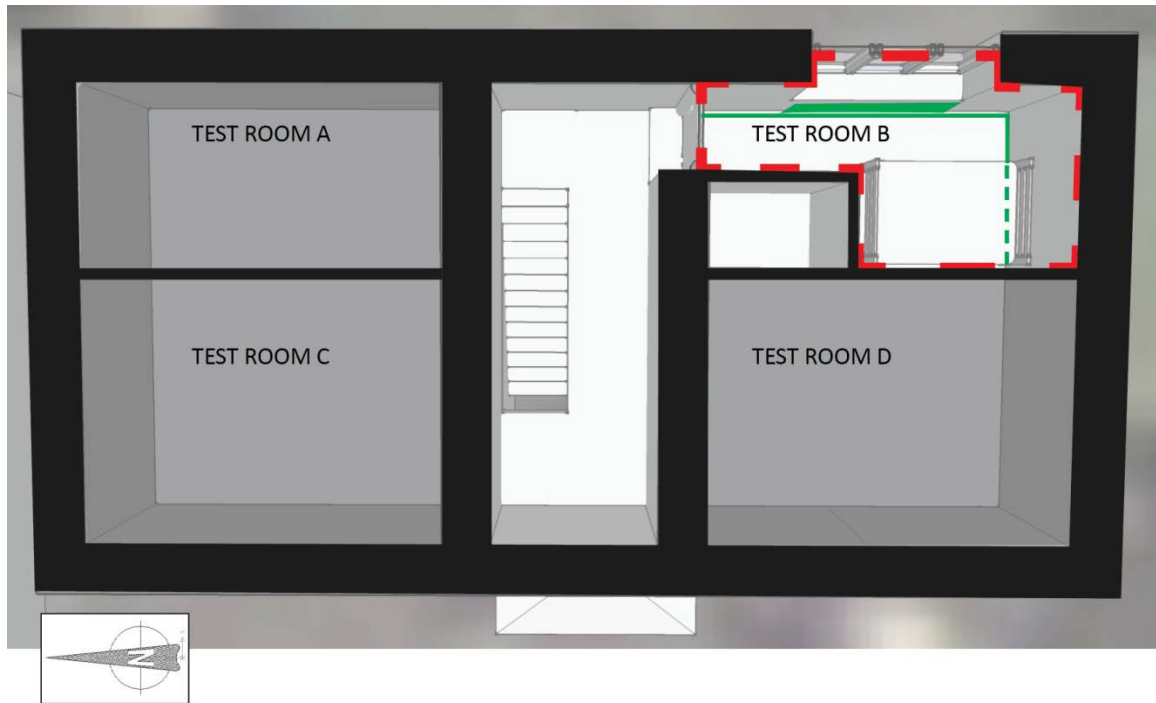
Second floor plan of test building at Rossinver, the chosen Test Room B is highlighted
